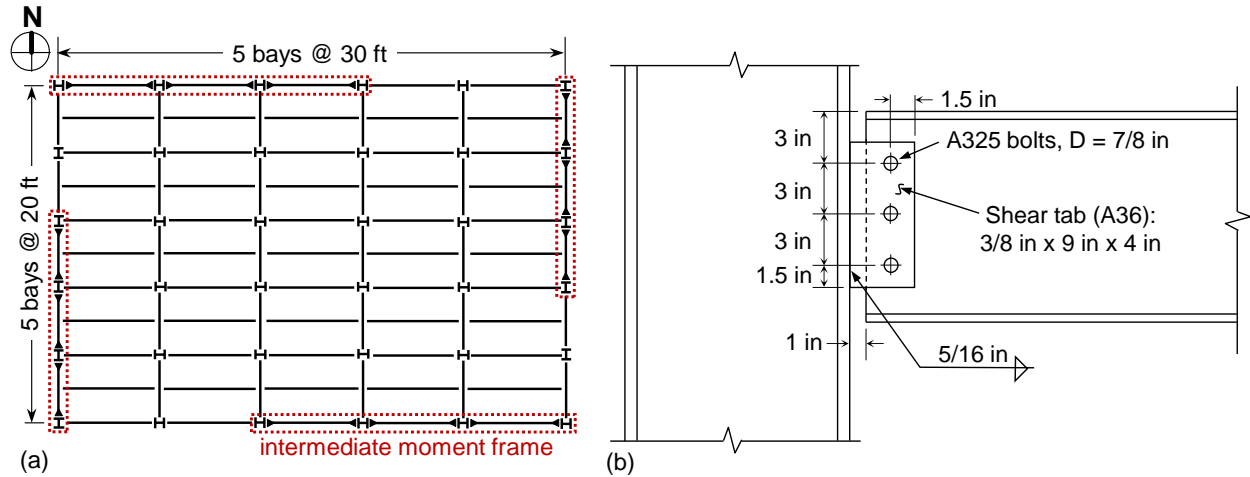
(a) Plan view of prototype building; (b) details of single-plate shear connections (1 ft = 0.3048 m, 1 in = 25.4 mm).
